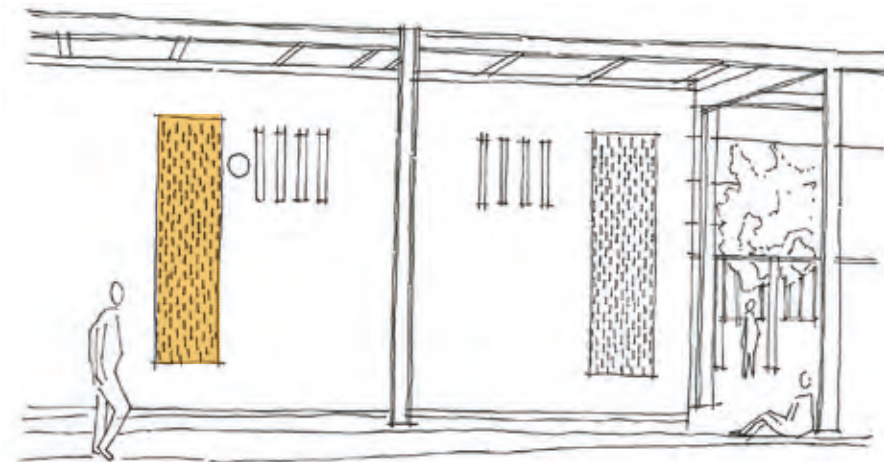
Sectional diagram depicting street permeability (Van Staden 2021).
